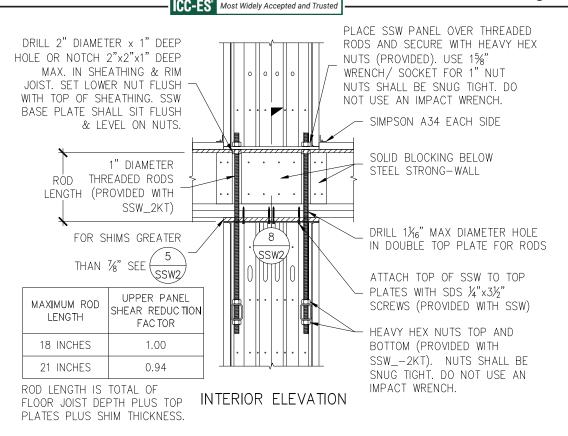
STEEL STRONG-WALL WOOD FLOOR DETAILS (Continued) (7/SSW2)
